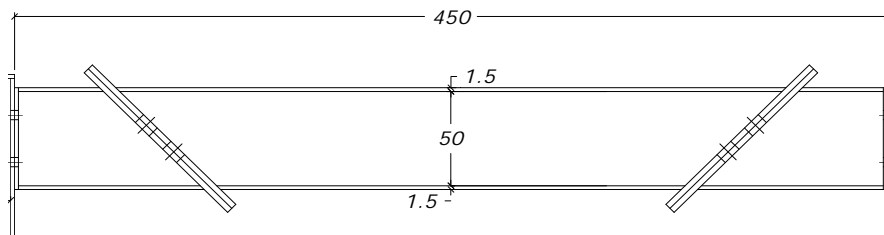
Geometrical details of the slant end-plate connection in a beam-to-column system for experimental study (all units are in mm).
